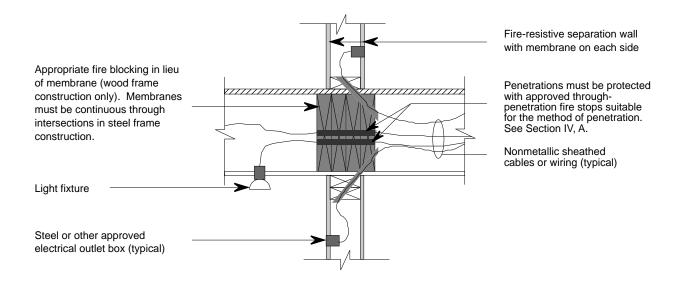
Wood or steel frame one- or two-hour fire-resistive separation wall at intersection with rated floor-ceiling assembly
